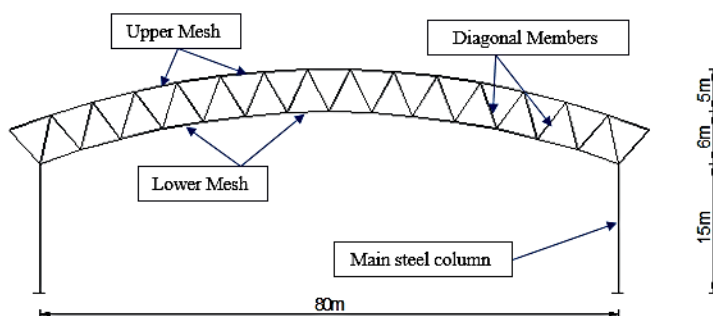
Cross section of arched space truss showing the supporting columns and truss elements.
